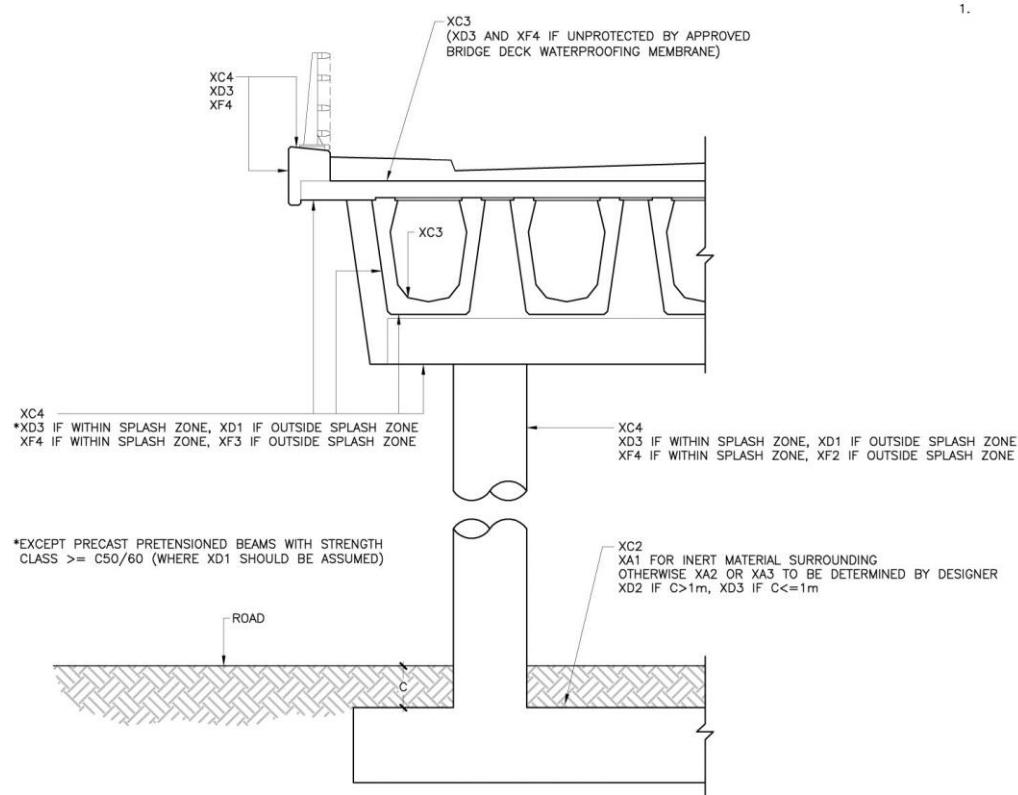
Underbridge Structure (Road Over Road) – Intermediate Support & Deck
